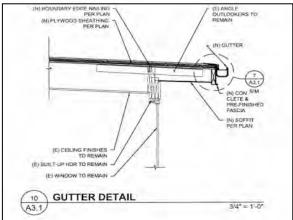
Structure 1 - Snipping of Detail 10/A3.1 Gutter Detail
